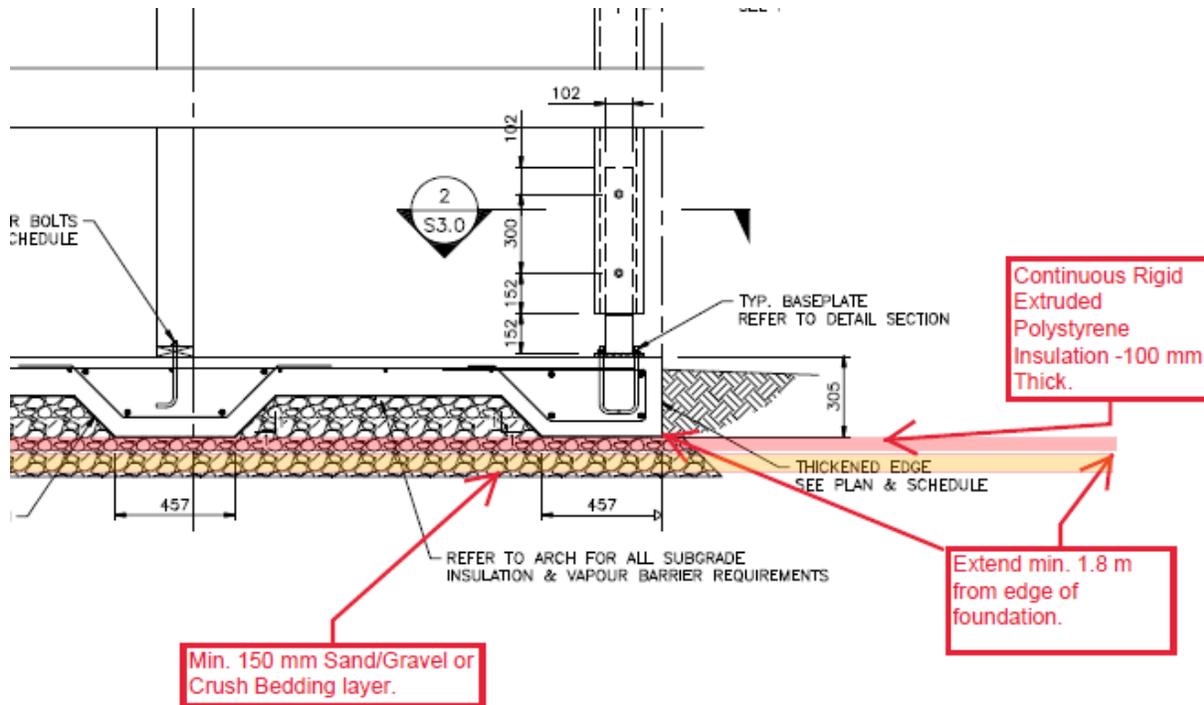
Insulation Details for Unheated Building (Based on foundation section in Figure 2)
